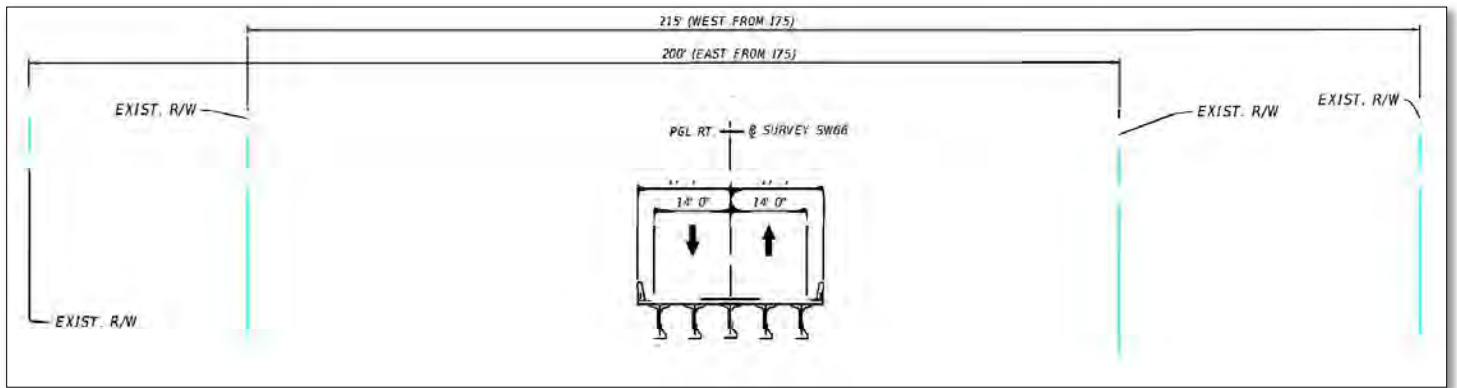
Existing Typical Section of SW 66th Street Bridge # 360048 (Over I-75)
